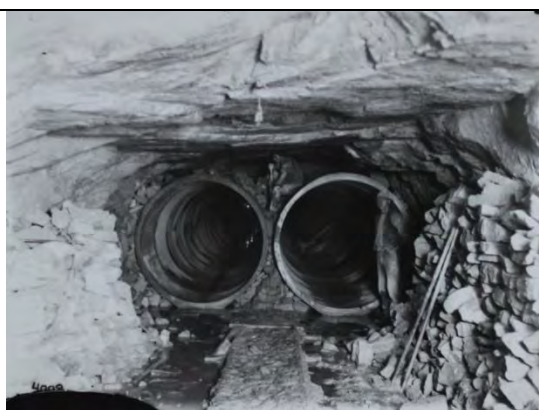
Pair of RC Monier conduits being installed in the sandstone tunnel under Darling Harbour. Rubble is stacked ready for packing around the 6 ft diameter pipes. State Rail Photos Series: 17420 Item: 364/45 SRNSW.
